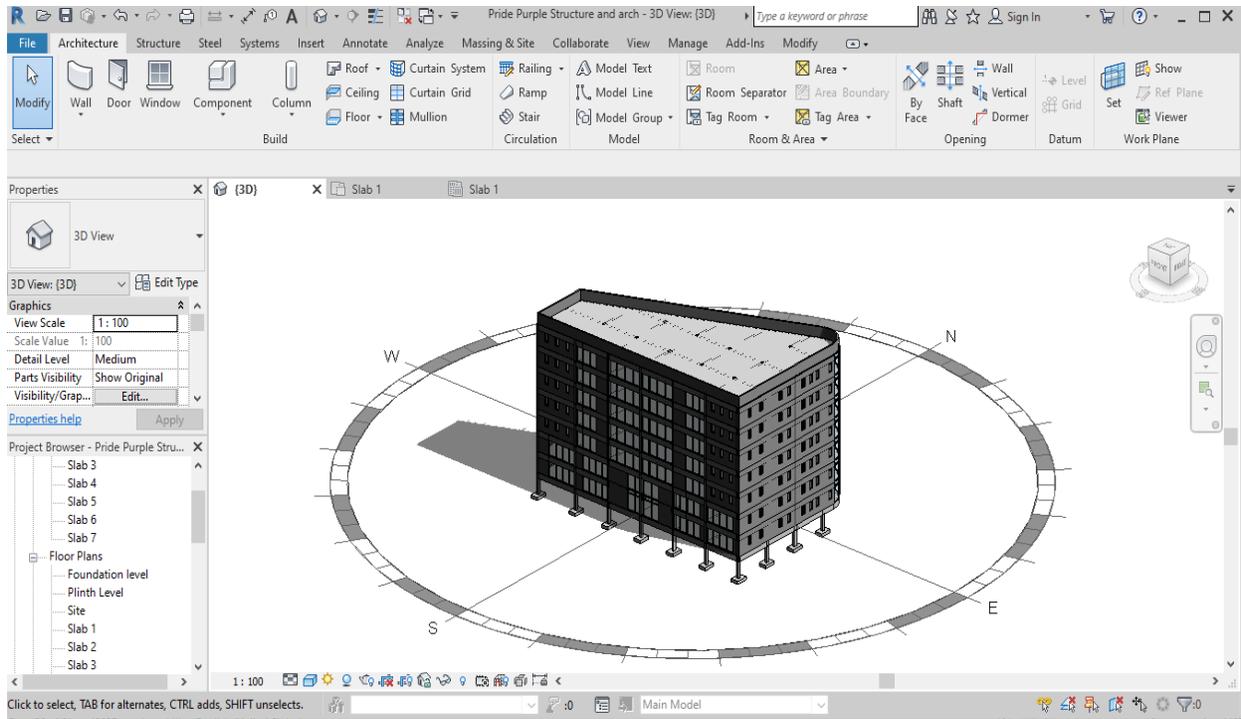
The plan is created in Revit Architecture at level 2, showcasing the column layout in the 3D view.
